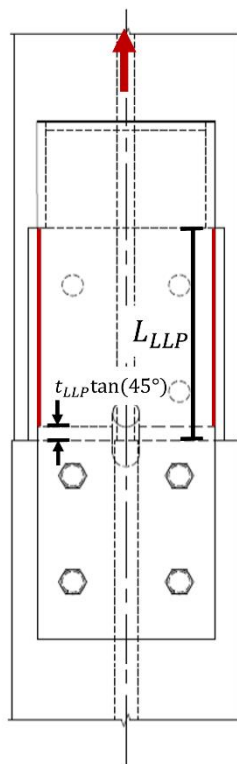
Weld location for design strength of the LLP to the Upper Column weld.
